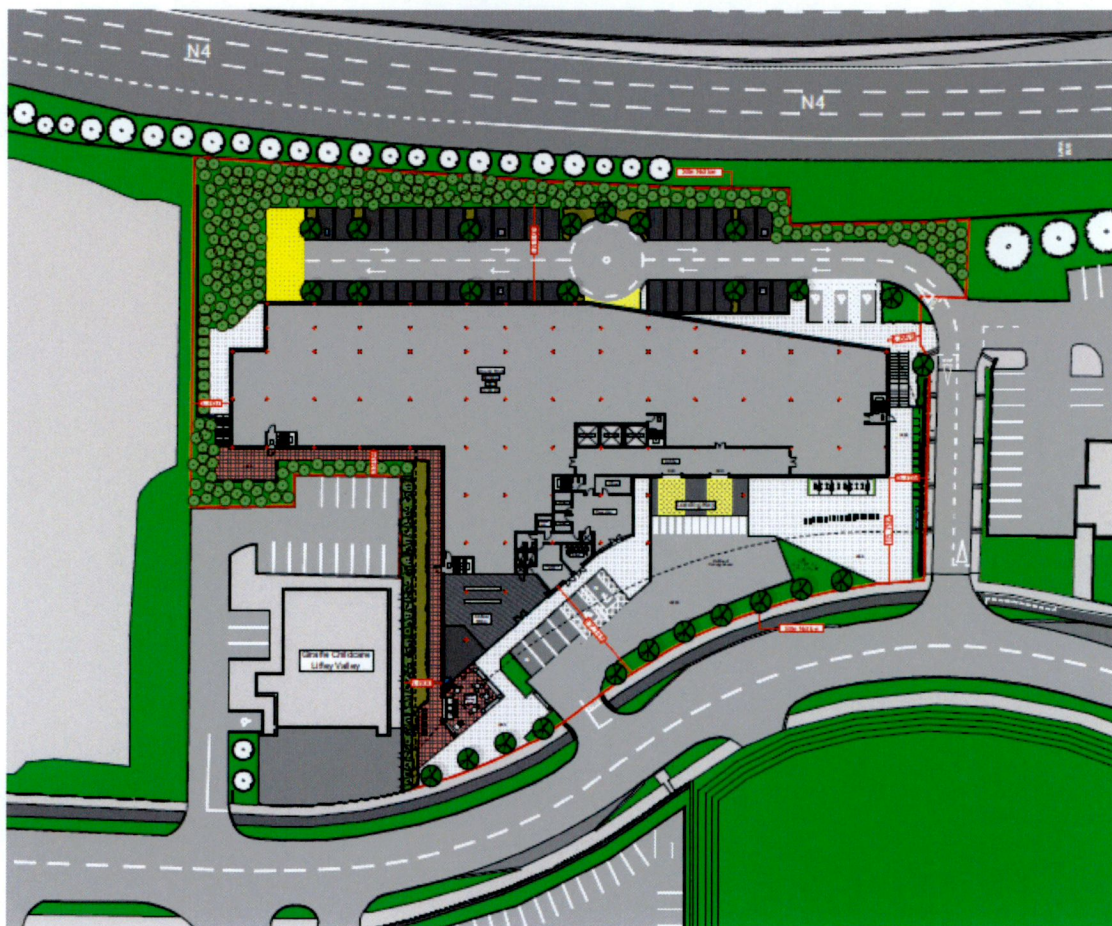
Proposed Site Plan. (Source: Carew Kelly Architects, Dwg. No. 20-04/202-)
